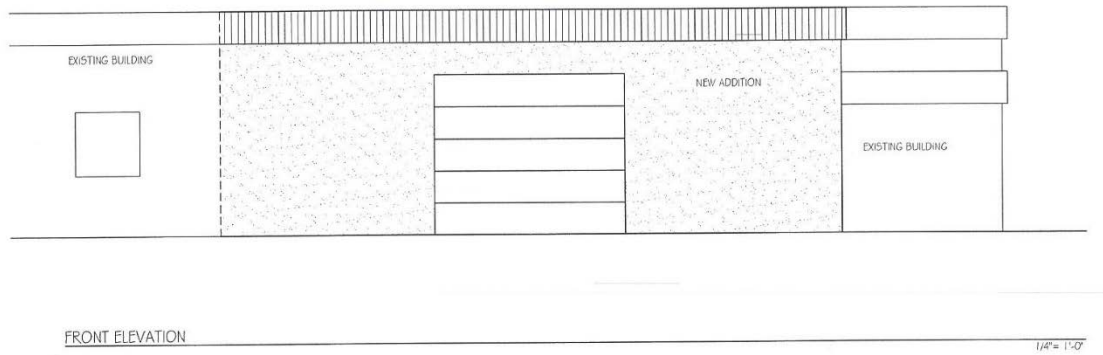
Rendering of Proposed New Addition to Subject Property-North Elevation.
